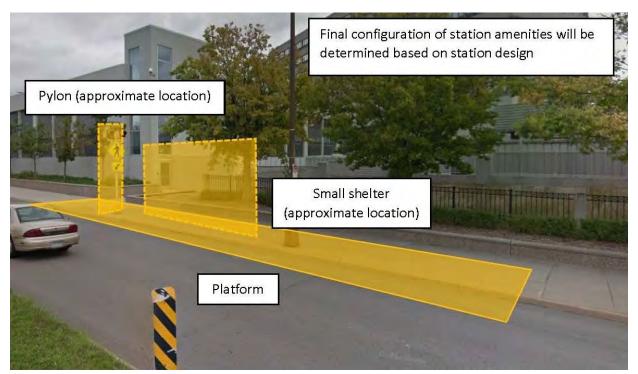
Rice Street and Fuller Avenue proposed northbound platform on the east side of Rice Street.
